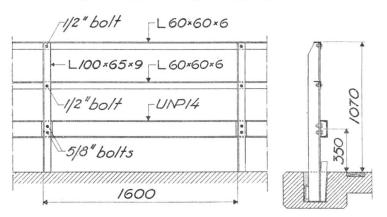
Standard parapet of the Royal Board of Roads and Waterways. Weight 36 kg/m.
